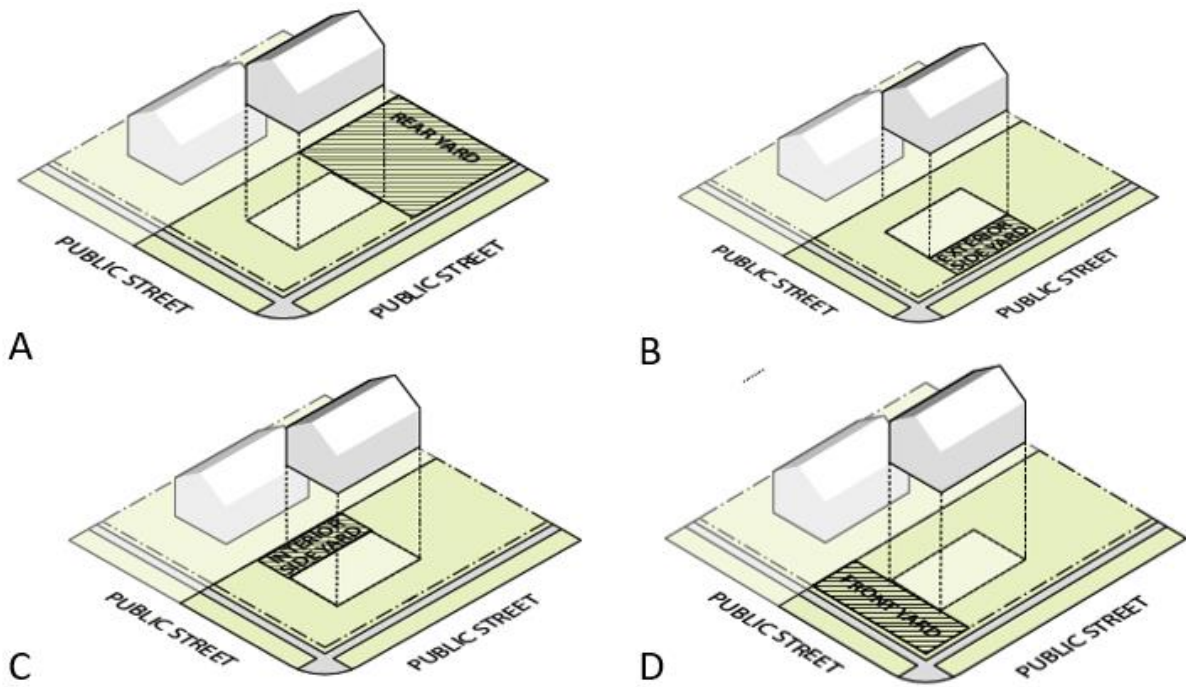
A. Rear yard; B. Exterior side yard; C. Interior side yard; and D. Front yard.
